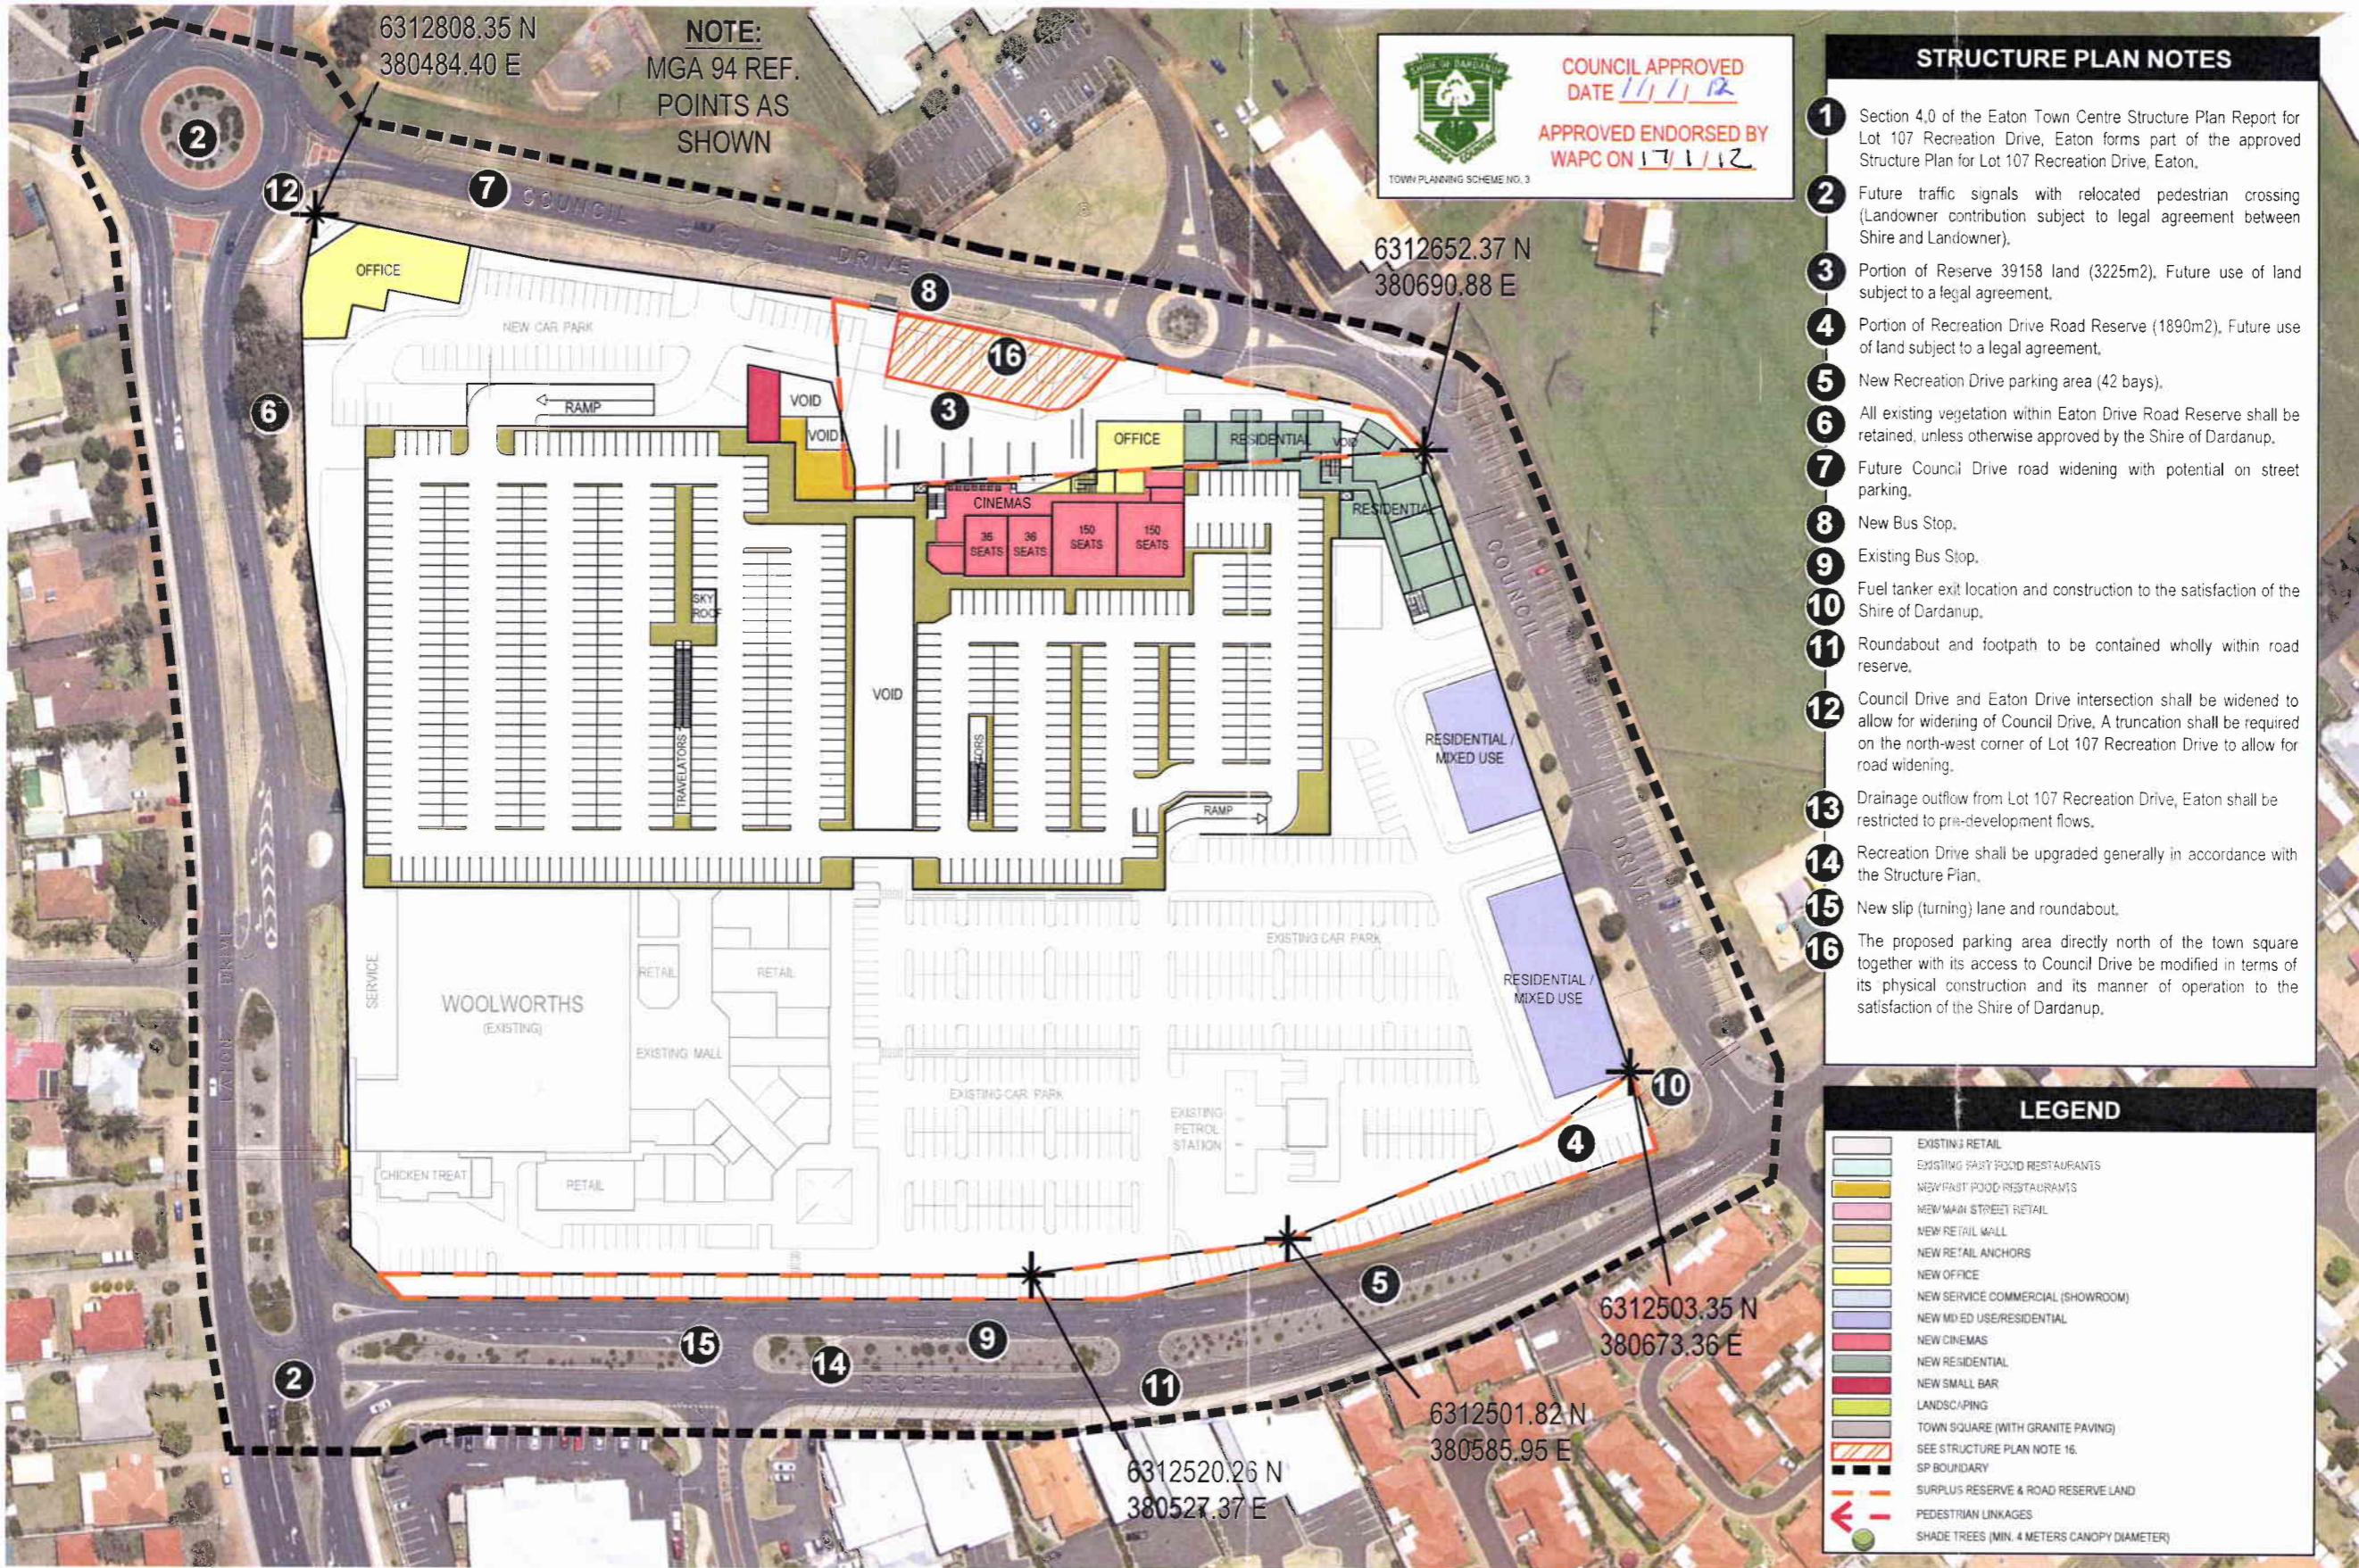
A: LOCAL STRUCTURE PLAN MAP GROUND FLOOR
